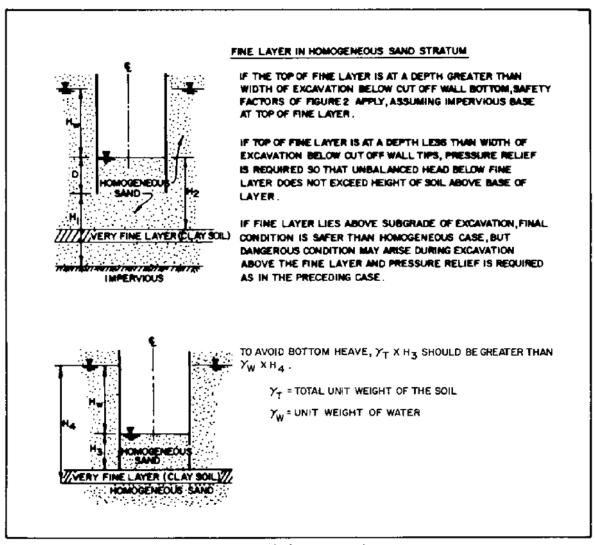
(continued) Penetration of Cut Off Wall Required to Prevent Piping in Stratified Sand
